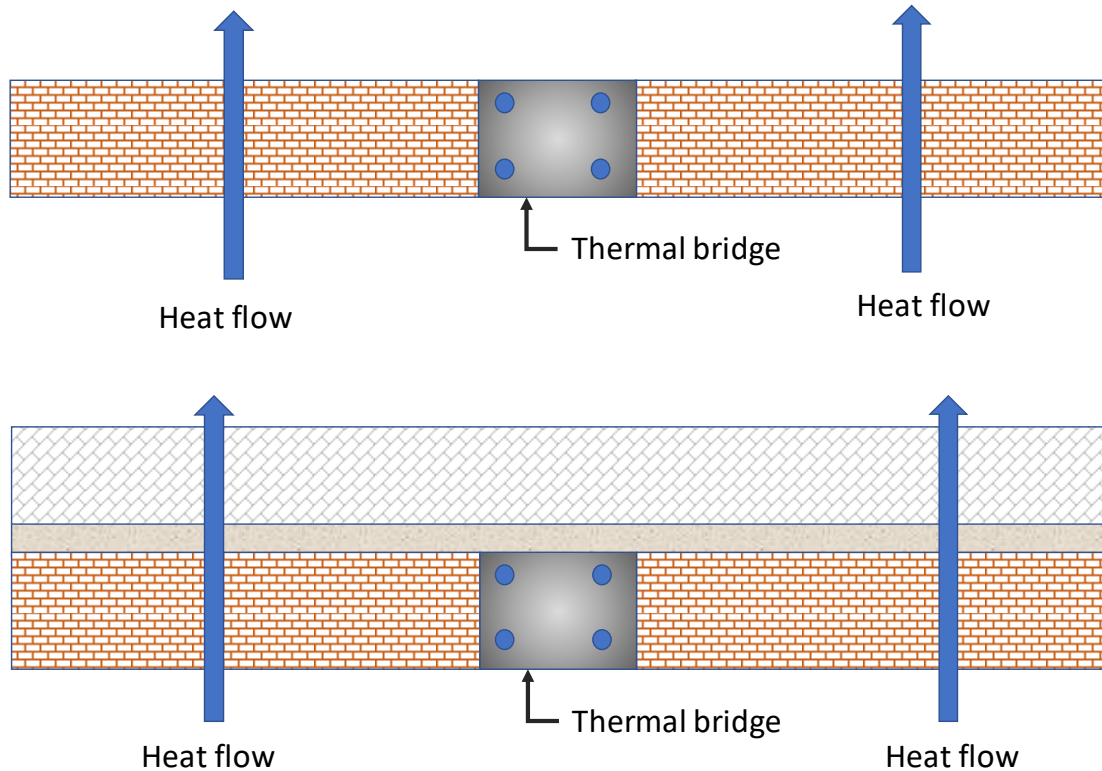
Brick wall with a concrete pillar as a thermal bridge (top) and twin wall with pillar thermal bridge (bottom)
